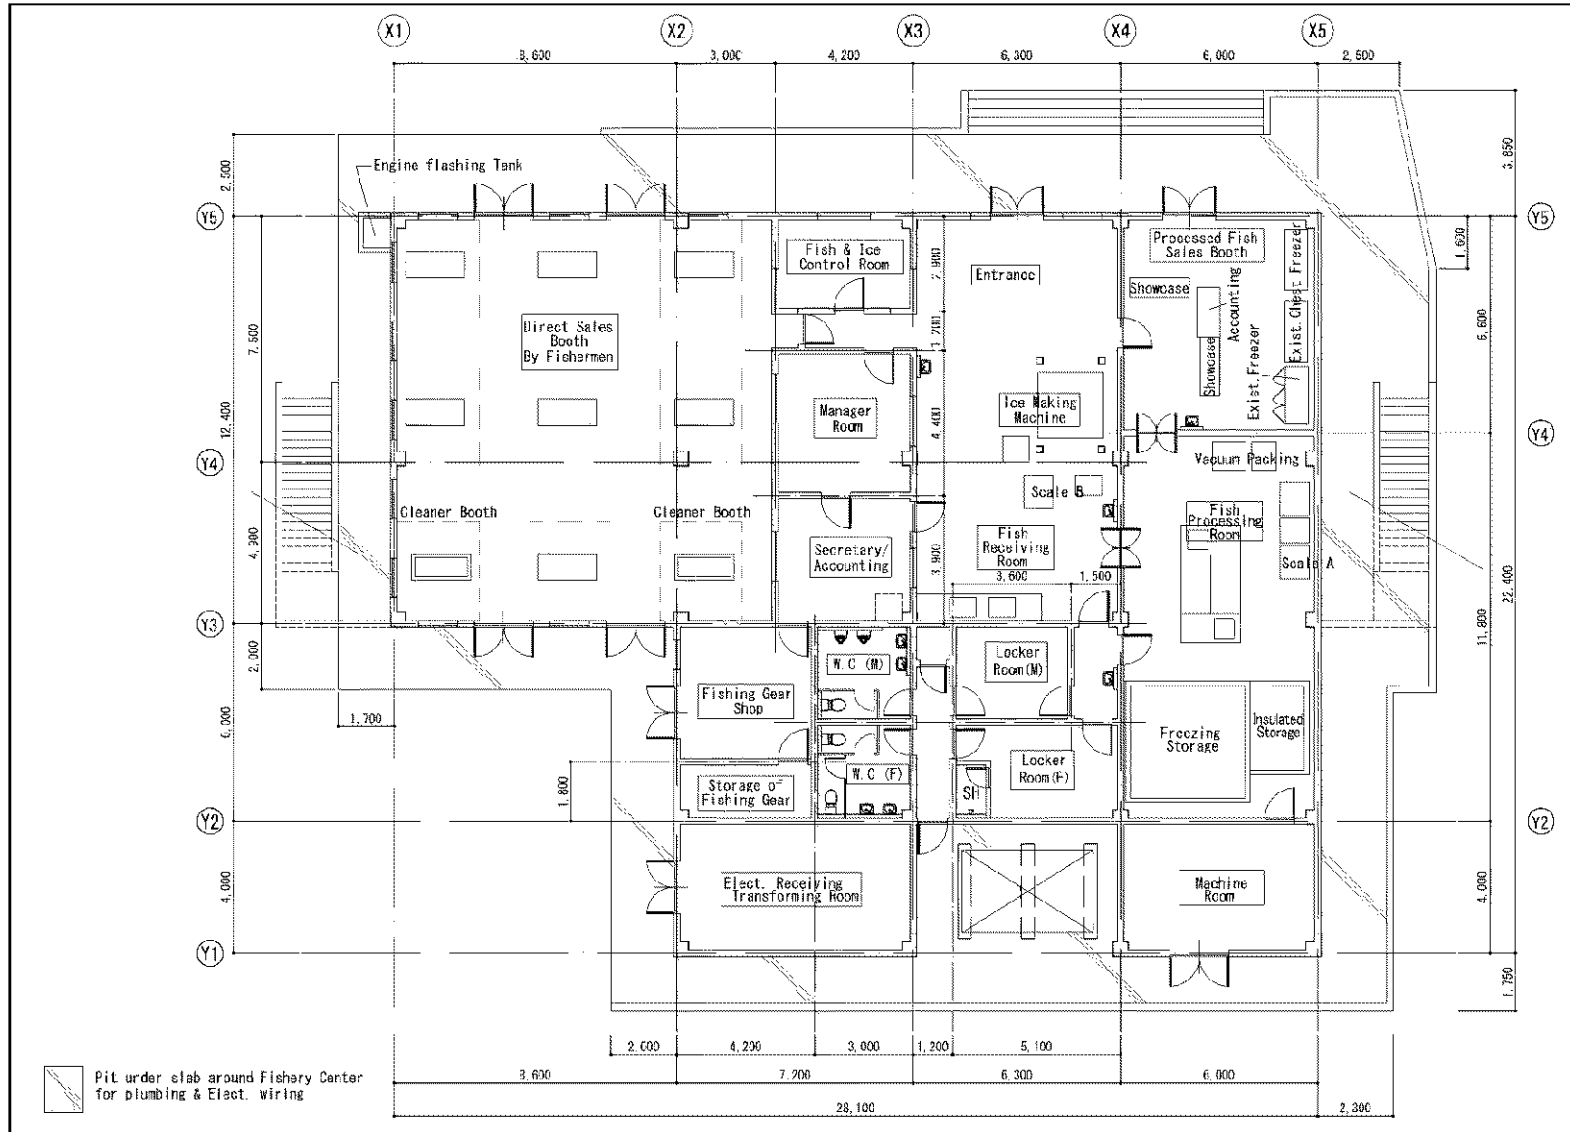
(6) New Fisheries Center (Ground Floor Plan)
